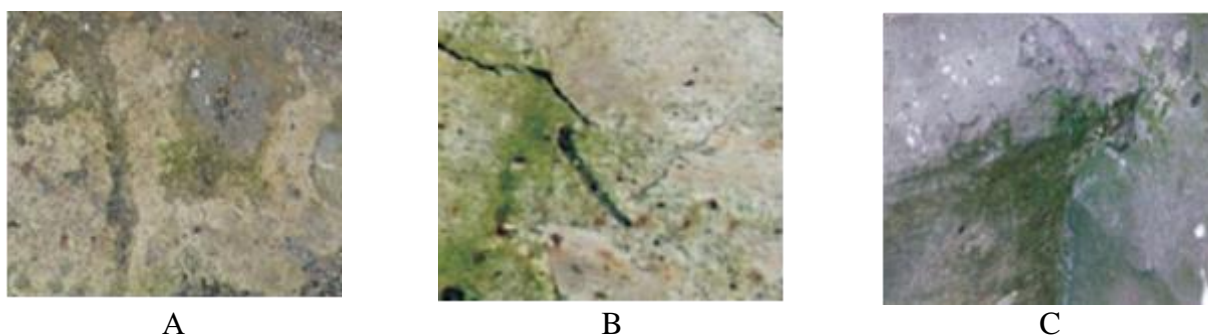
Biofouling of concrete surfaces: A, Б - removal of the top layer; B - cracking of the reinforced concrete slab
